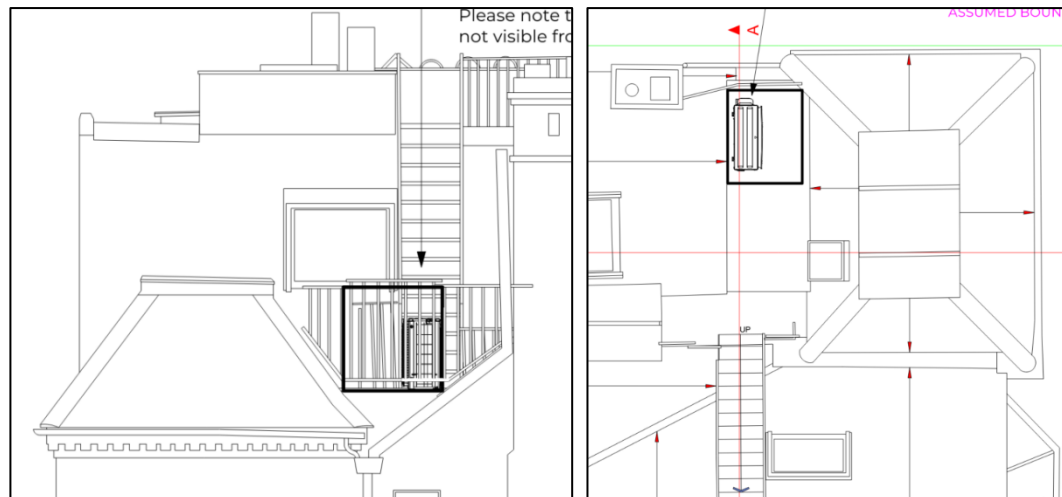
& 2. Excerpt from proposed side elevation and proposed roof plan.
